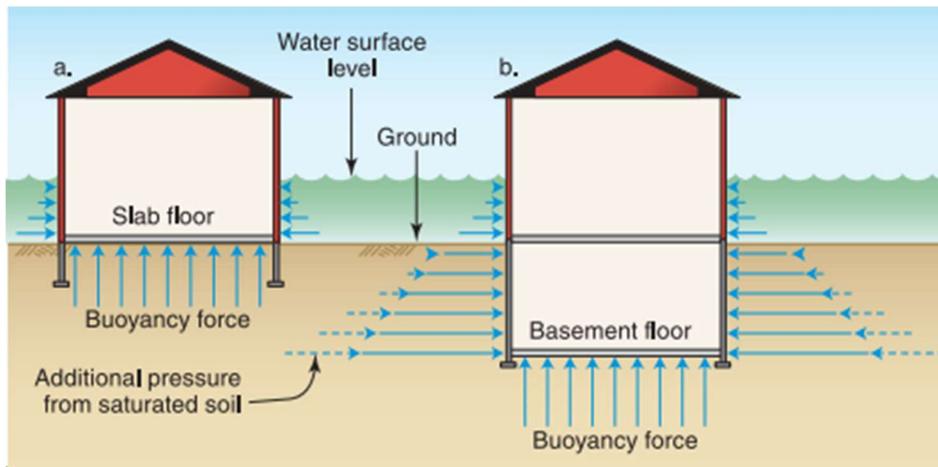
Hydrostatic pressures exerted on a building during flooding (FEMA, p. 29)
